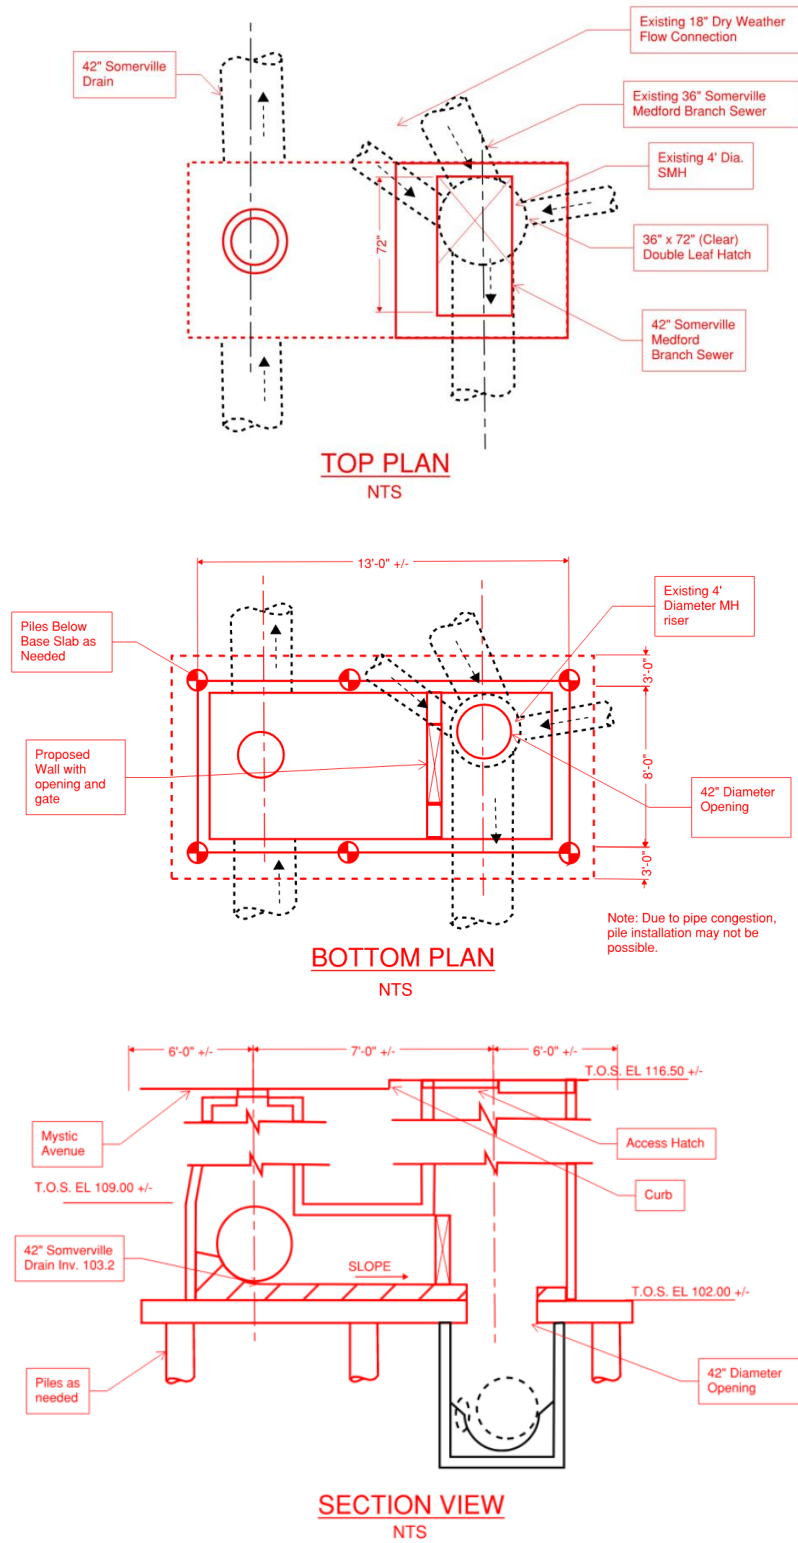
Alternative 2.2 Chamber Plans and Section
